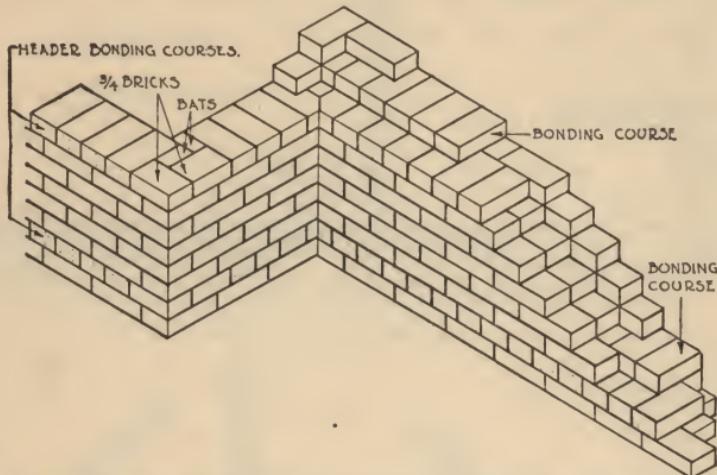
,228.—Outside and inside corners in common or American bond, 8 and 12 in. walls.
